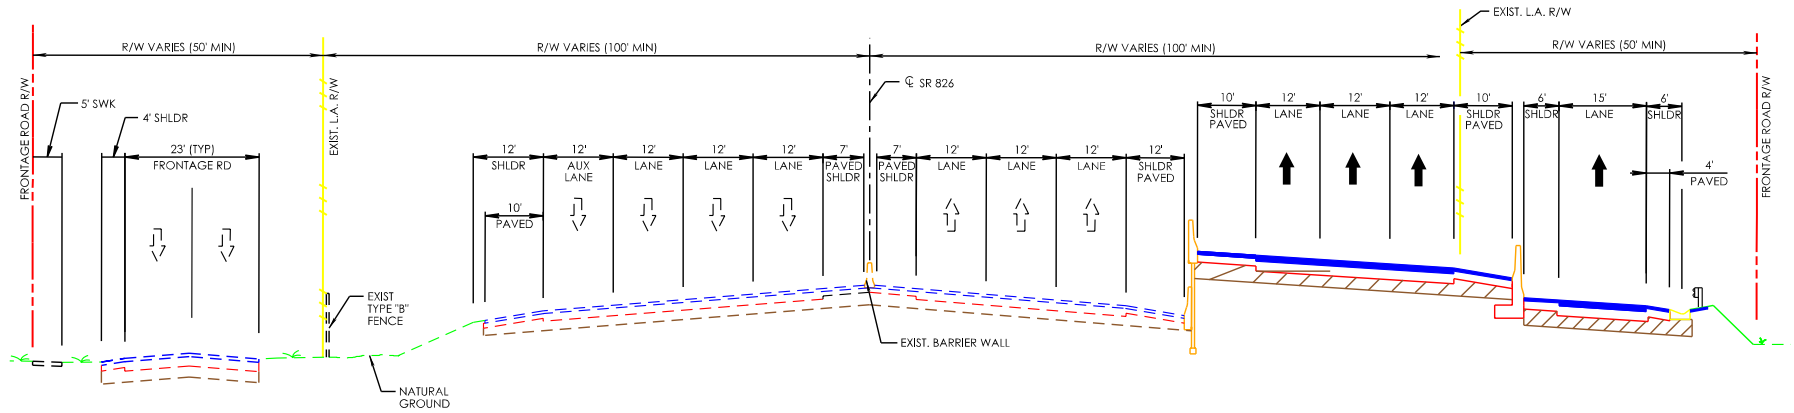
Proposed Typical Section- SR 826 W. of NW 12th Avenue- Alt. 4
